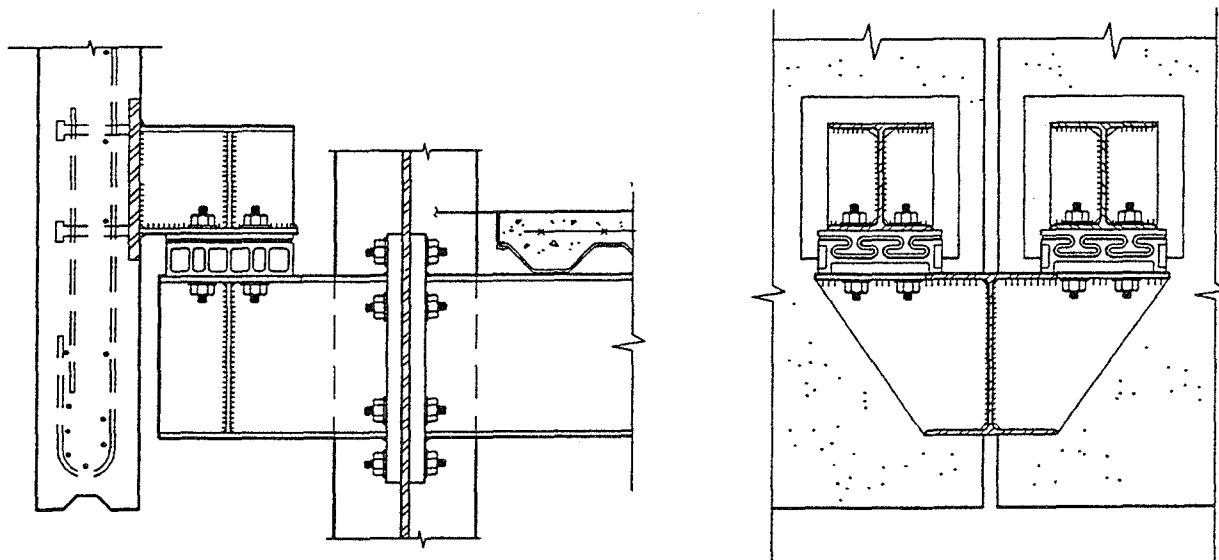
Structural details (steel column) (from Kemeny and Lorant [1989]).
